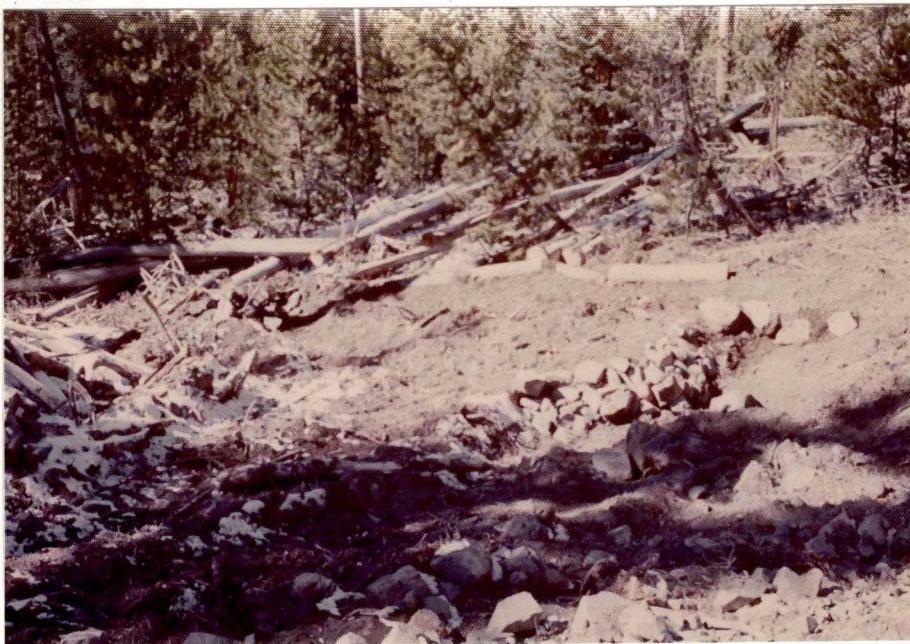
Depression basin on a steep fill slope on the Sheep Creek Road.
